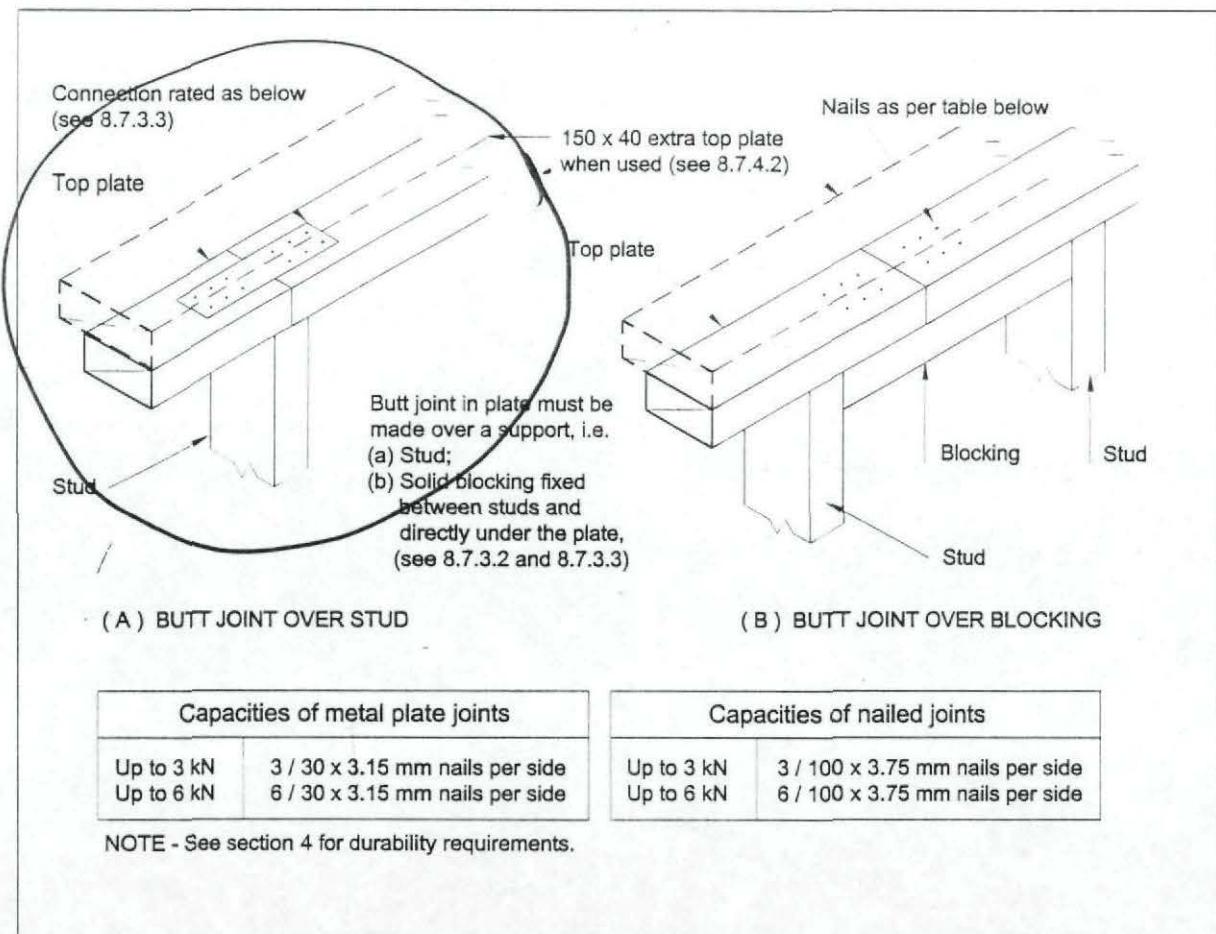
Connecting top plates in line – Walls containing bracing (see 8.7.3.3)
